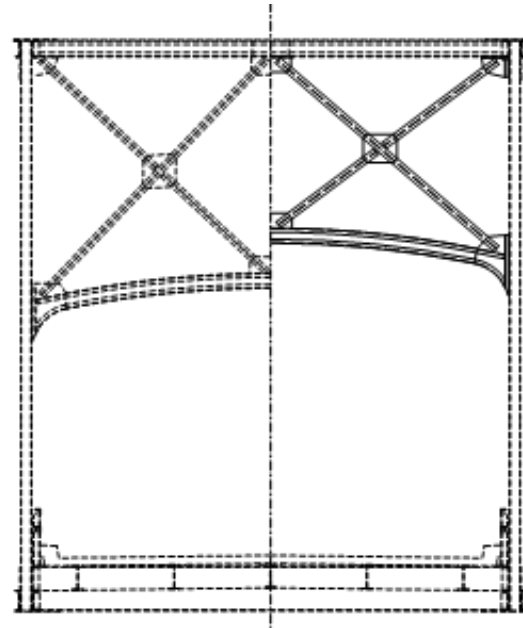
Before and After View of Sway Bracing Reconstruction.
